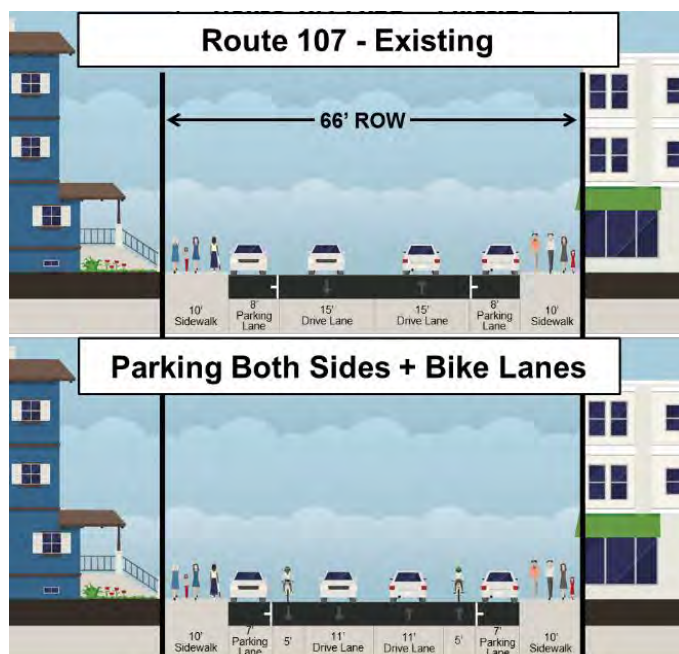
Cross-section – Parking Both Sides + Bike Lanes
